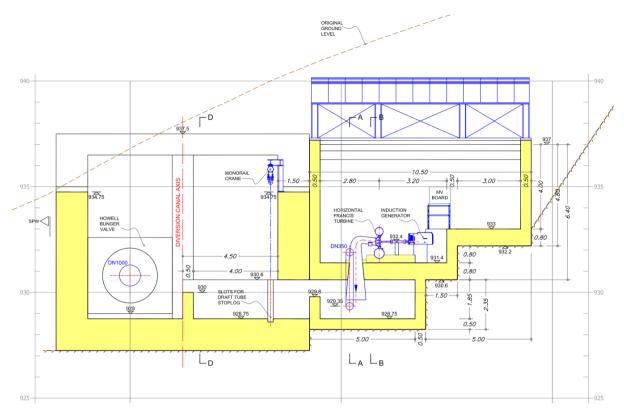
Powerhouse – Vertical Cross-section (Section C) (Studio Pietrangeli, 2019)
